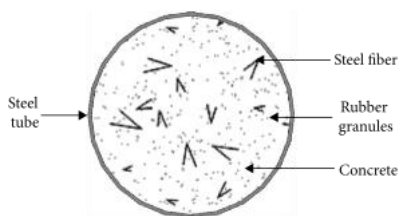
Section form of steel fiber reinforced rubber concrete filled steel tube column.
